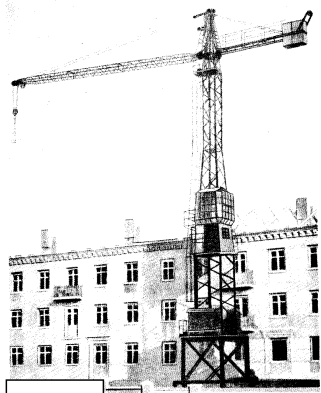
SOVIET PHOTOGRAPH OF A TYPICAL TOWER CRANE USED IN CONSTRUCTION WORK THROUGHOUT THE SOVIET UNION. The tower crane of Site 1D is similar to this type crane.
